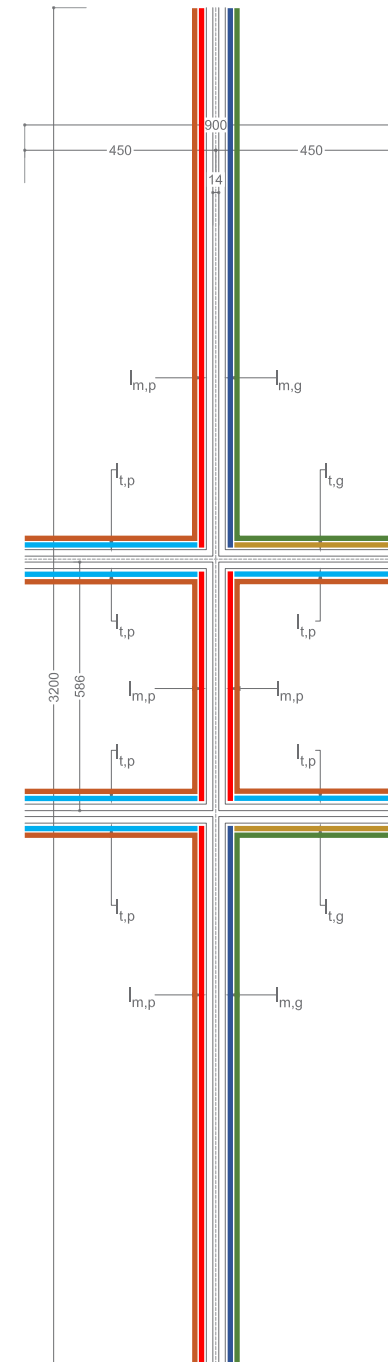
Enlarged elevation showing lengths of facade components of typical wall for selected case (Source – Author)
